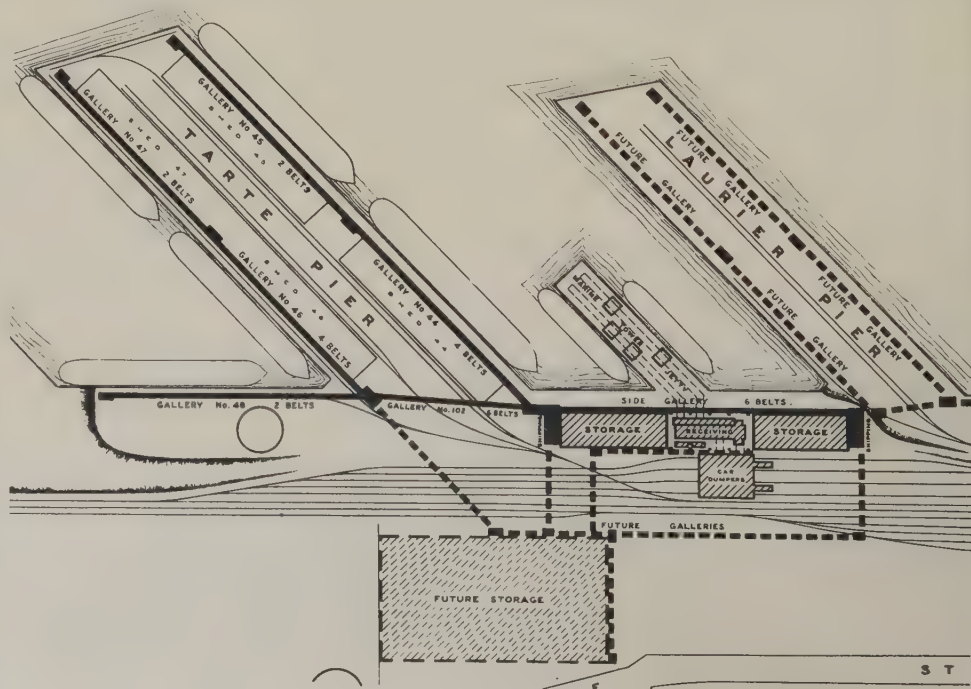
Ground Plan Elevator No. 3 of Harbor Commissioners of Montreal.
